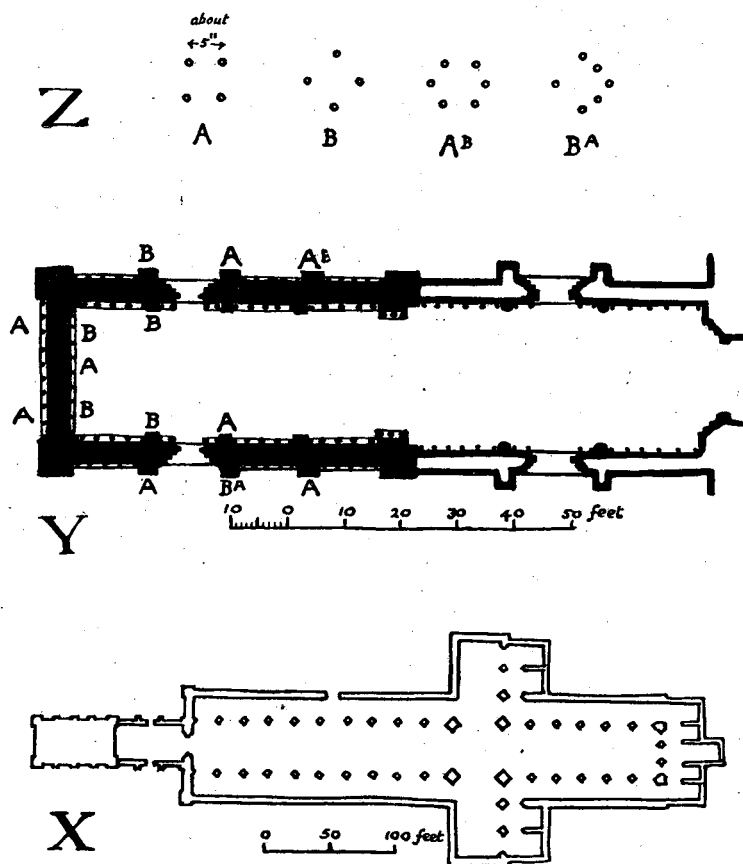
Glastonbury. X. Plan of the Abbey Church. Y. Plan of St Joseph's Chapel and Porch. Z. Pin-holes for crosses.
